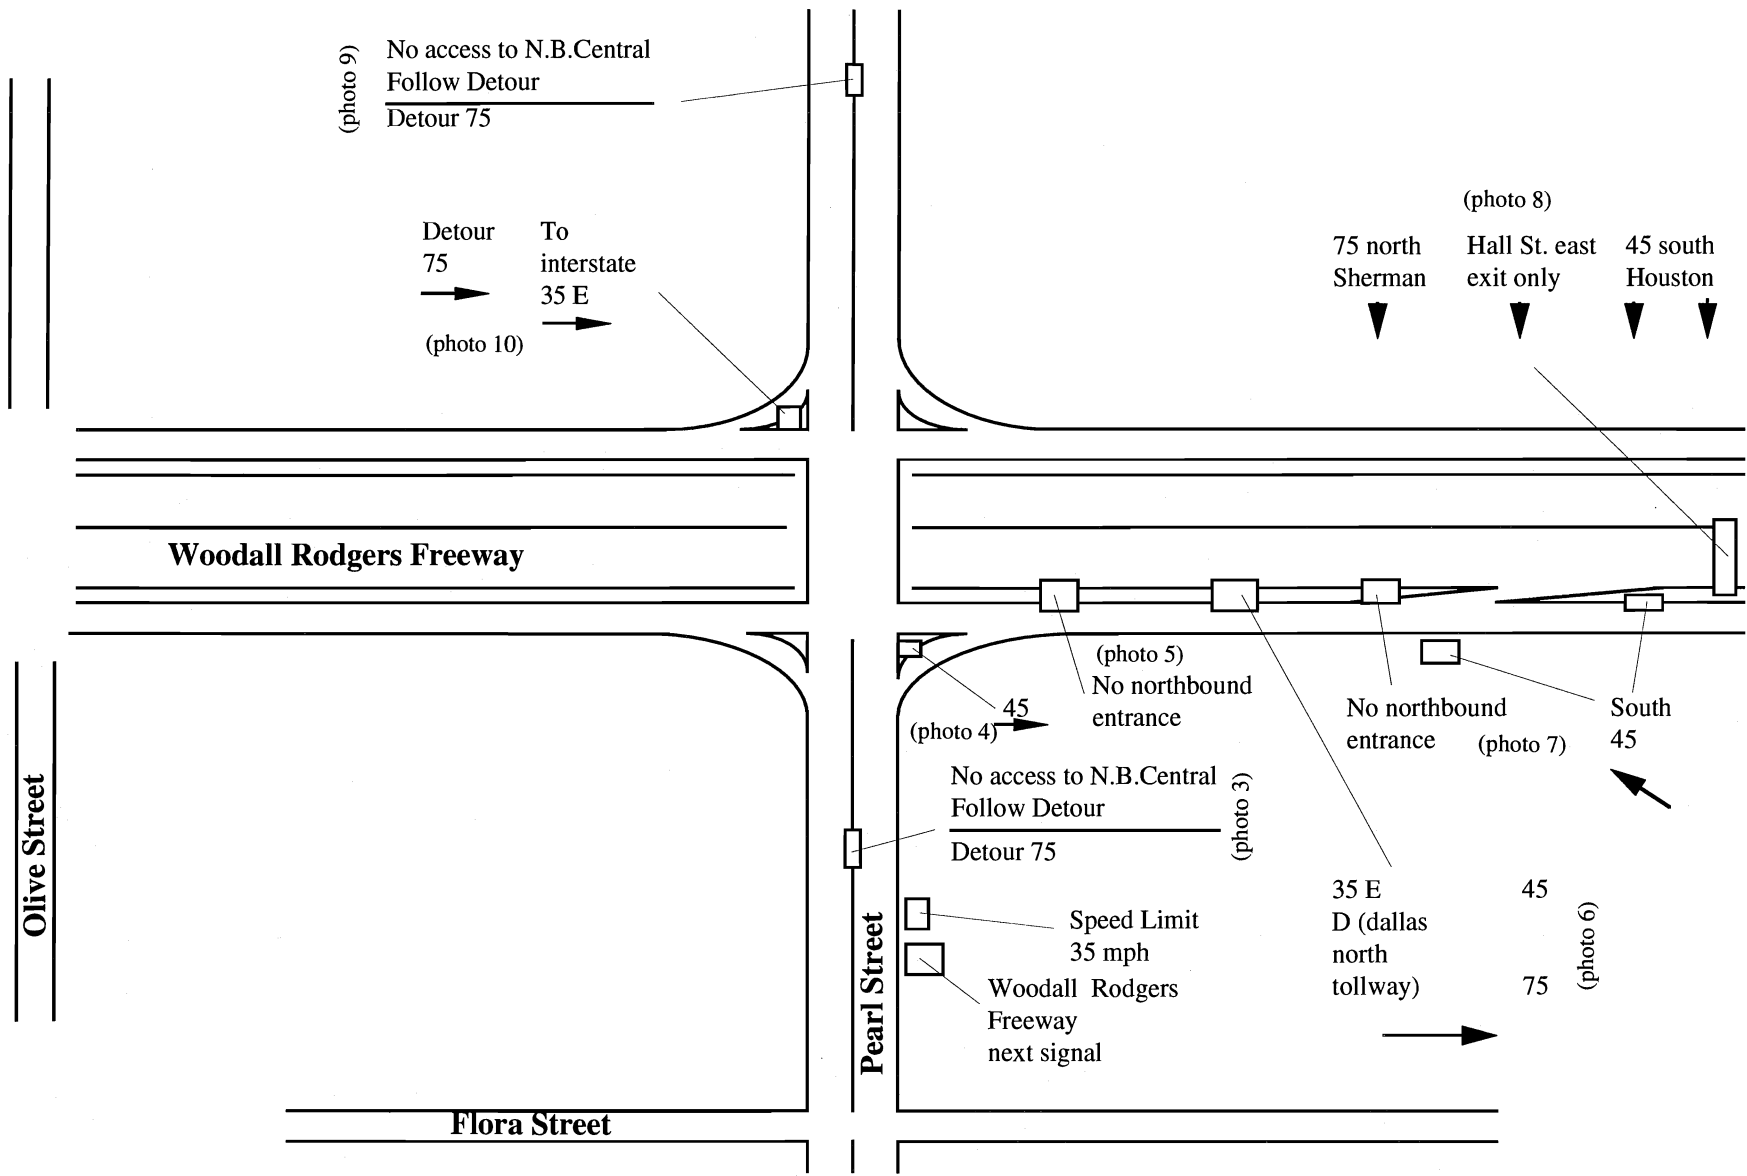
Existing traffic control plan at the intersection of Pearl Street and Woodall Rodgers Freeway.
